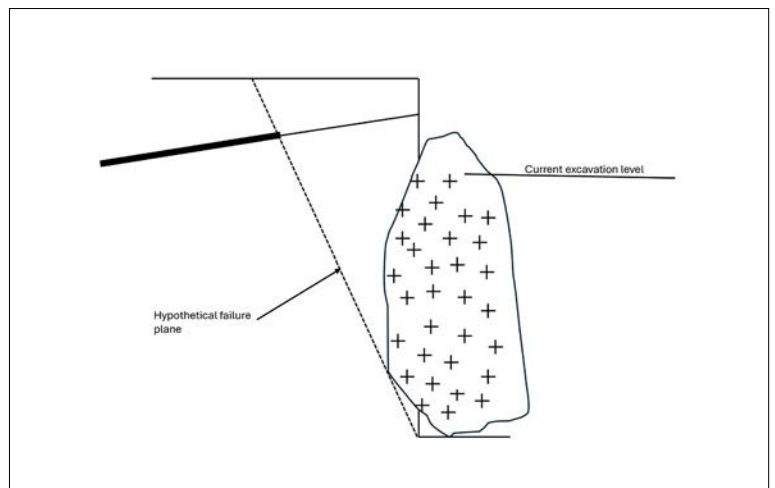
Large corestone extending to bulk excavation level but not fully intercepting the failure plane.
